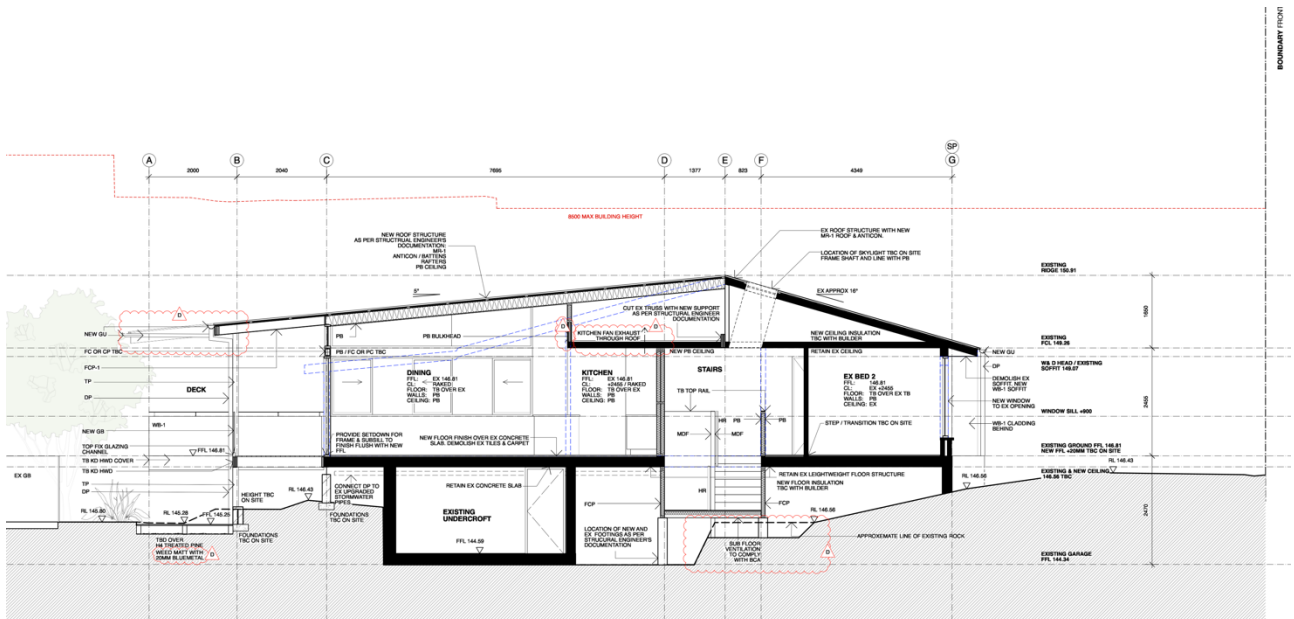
CDC Section BB 11 Jones Street, Beacon Hill
